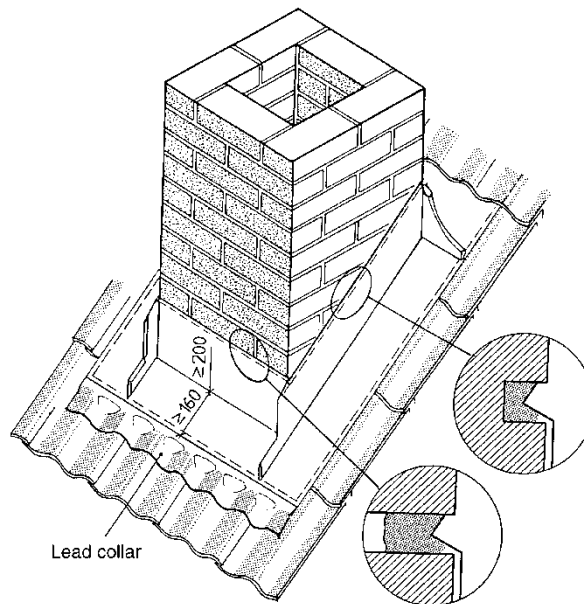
Recommended design of foot flashing for a brick chimney in sheltered areas
